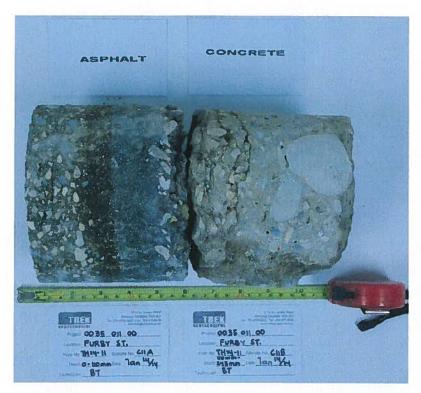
Asphalt and Concrete Core Sample from Test Hole TH14-11
